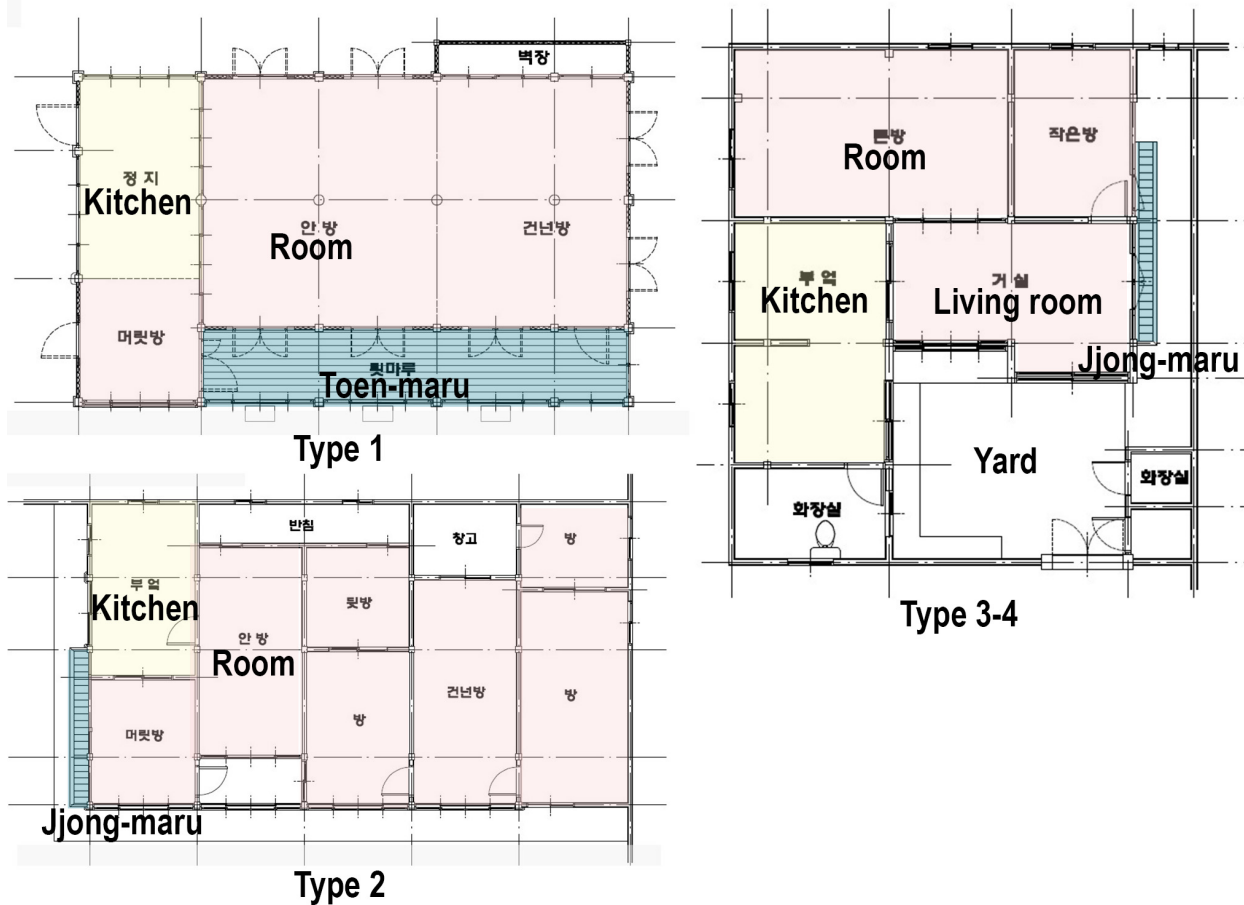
An example of the modern Hanok floor plan. The maru (blue area) has been reduced. Daecheong-maru has disappeared and has become a room or living room (pink area).
